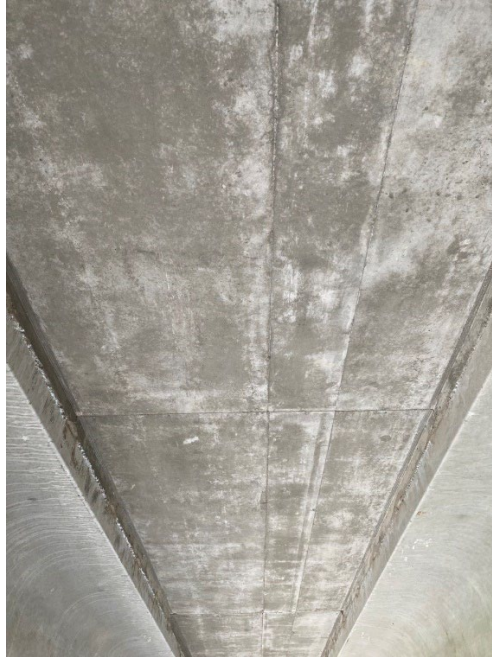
Underside of MN-IC-LC-HPC-9 bridge deck
